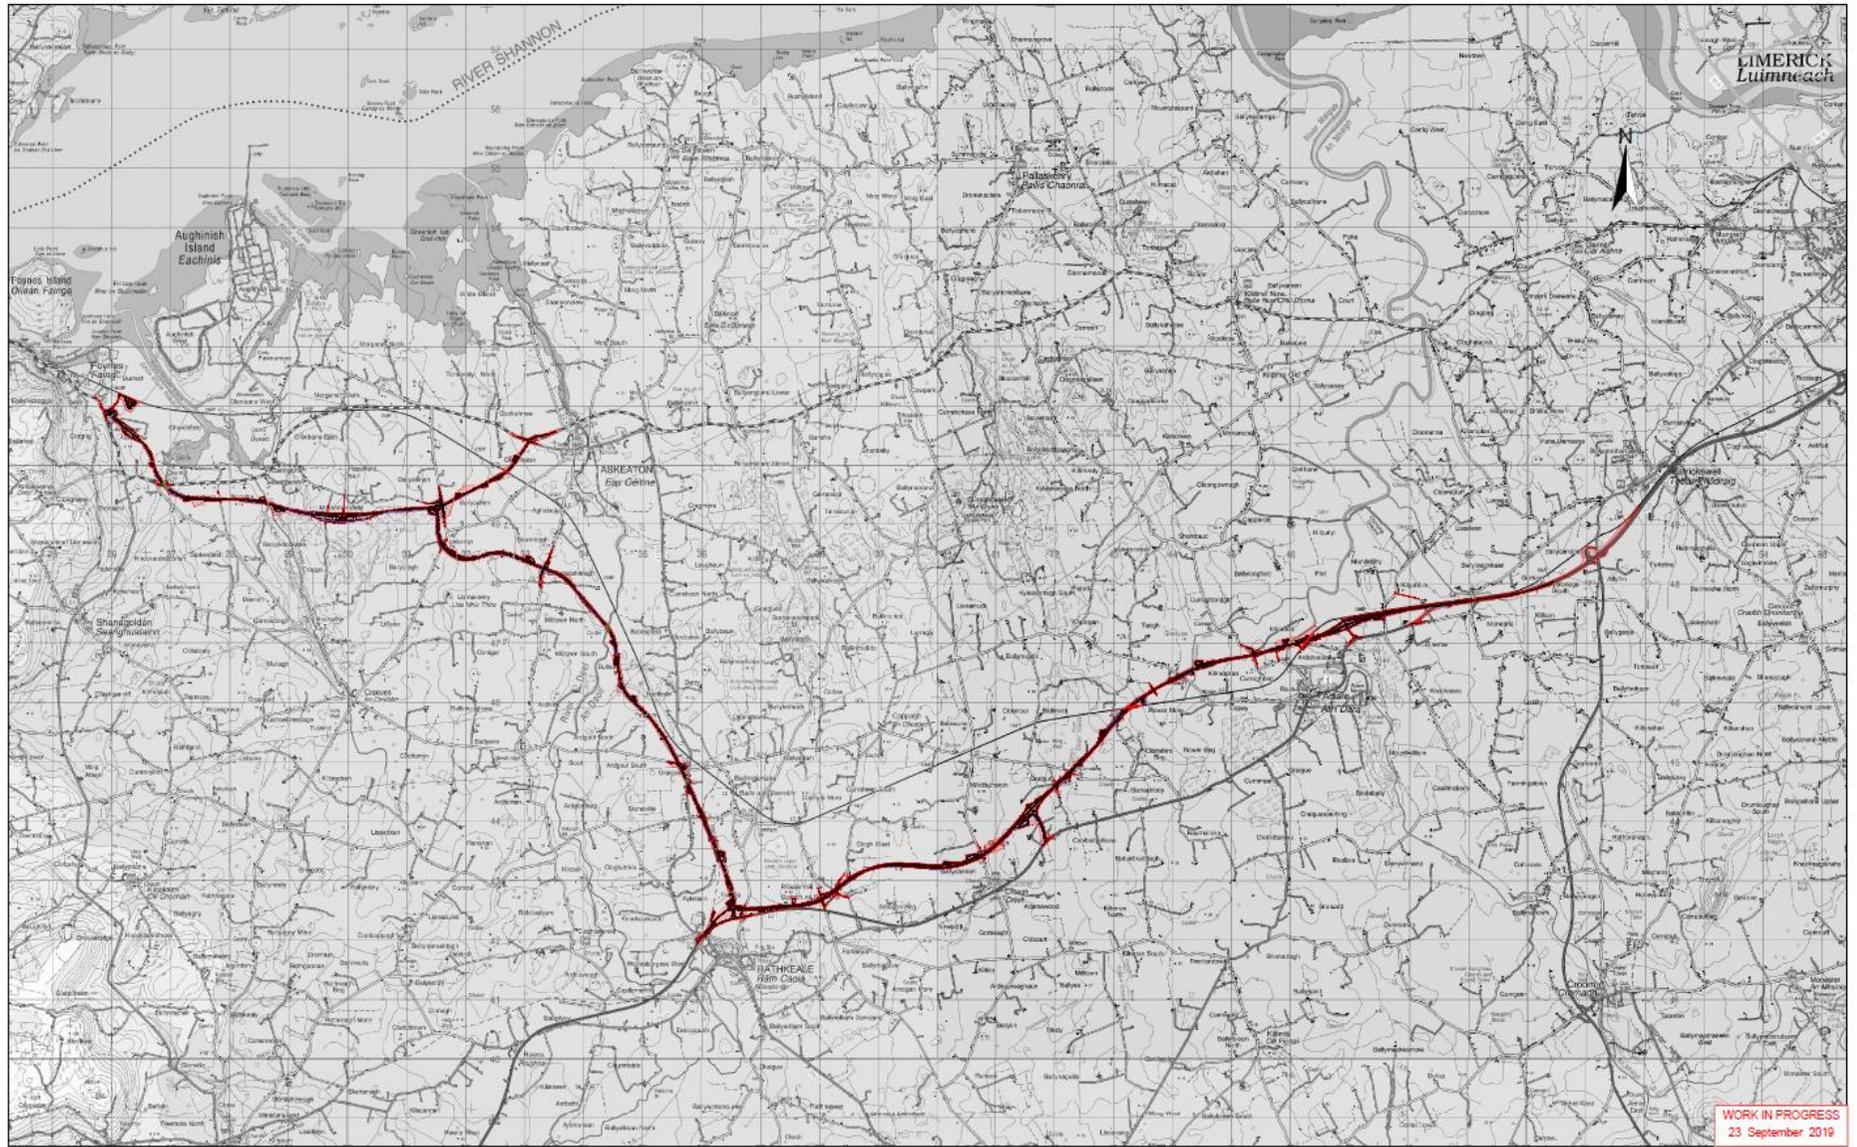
Proposed Road Development with Lands required for construction marked in red.
